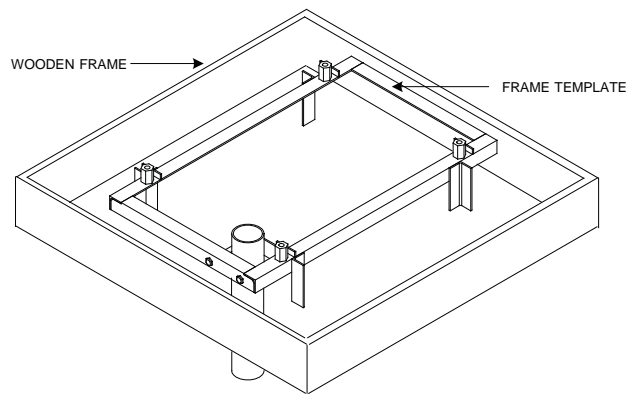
, Pad frame and mounting template CE-3x2 5.0 kW
